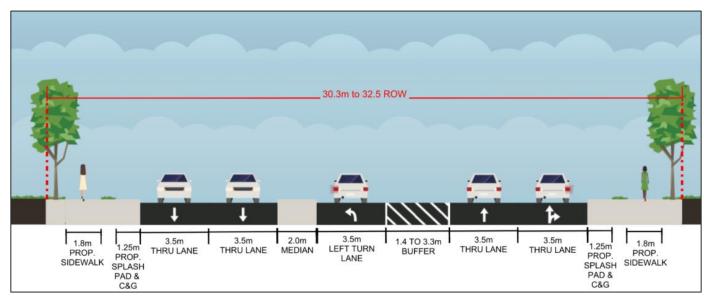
Menkes Drive/Telford Way Typical Cross Section on Menkes Drive (facing north)
